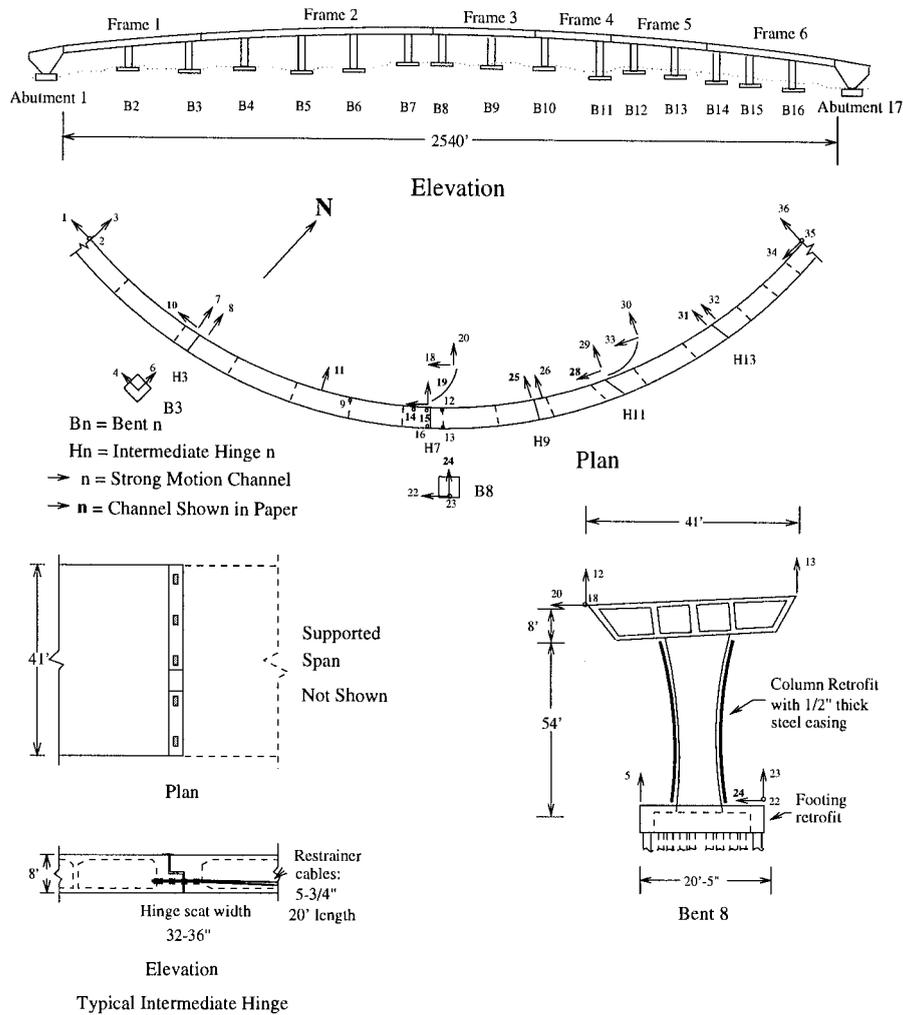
General plan and instrumentation for the Northwest Connector at the Interstate 10/25 Interchange.
